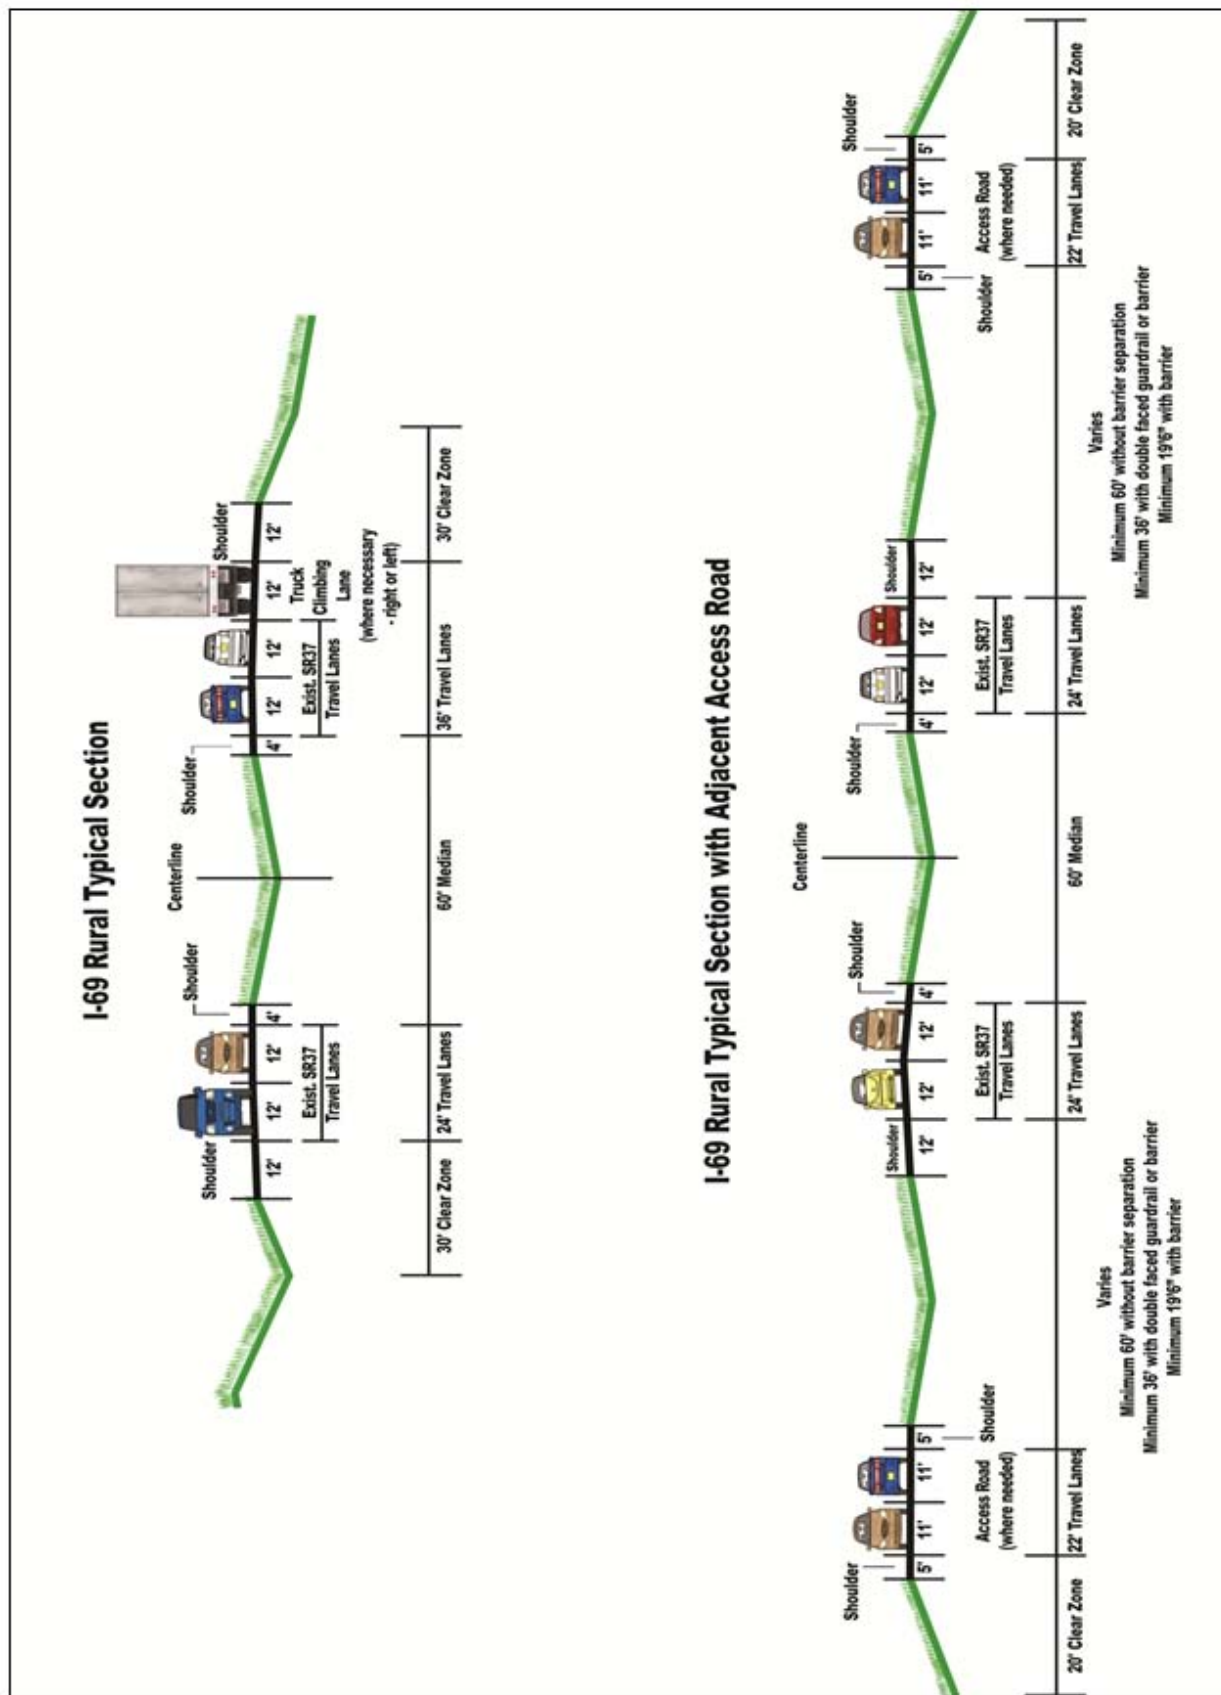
Tier 2 Section 5 – Minimal Impact Typical Sections for Alternatives 6, 7, 8, and Refined Preferred Alternative 8 (Sheet 1 of 2)
